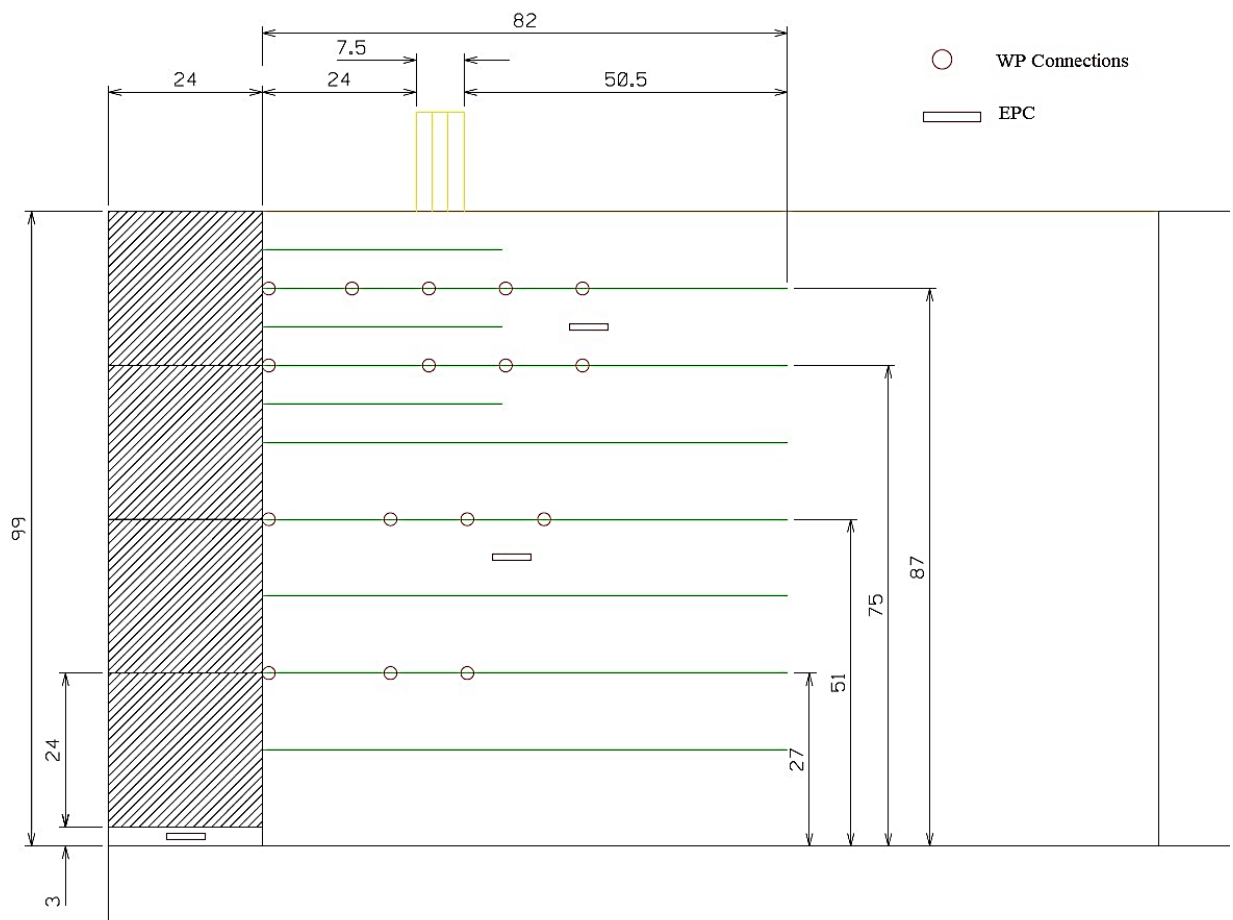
Schematic instrumentation layout for GRS Abutment Model #3 (Large concrete block facing with 12-inch reinforcement spacing; Dimensions are in inches)
